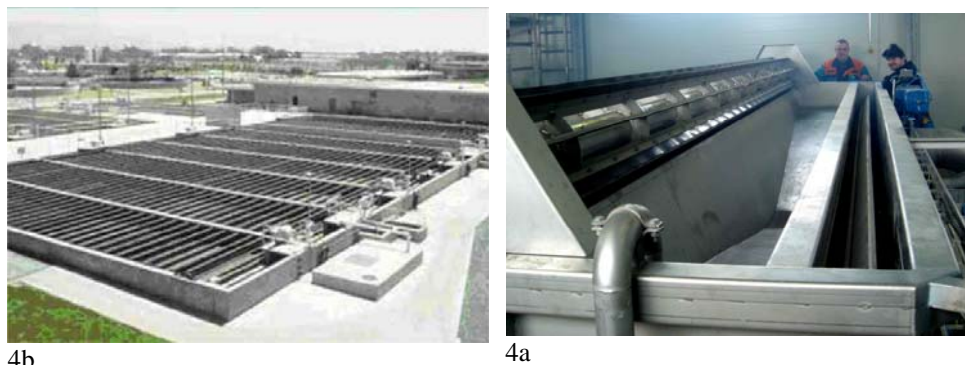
Surface sludge can be removed using chain scrapers (4a) or (4b) sludge rollers (flippers)
